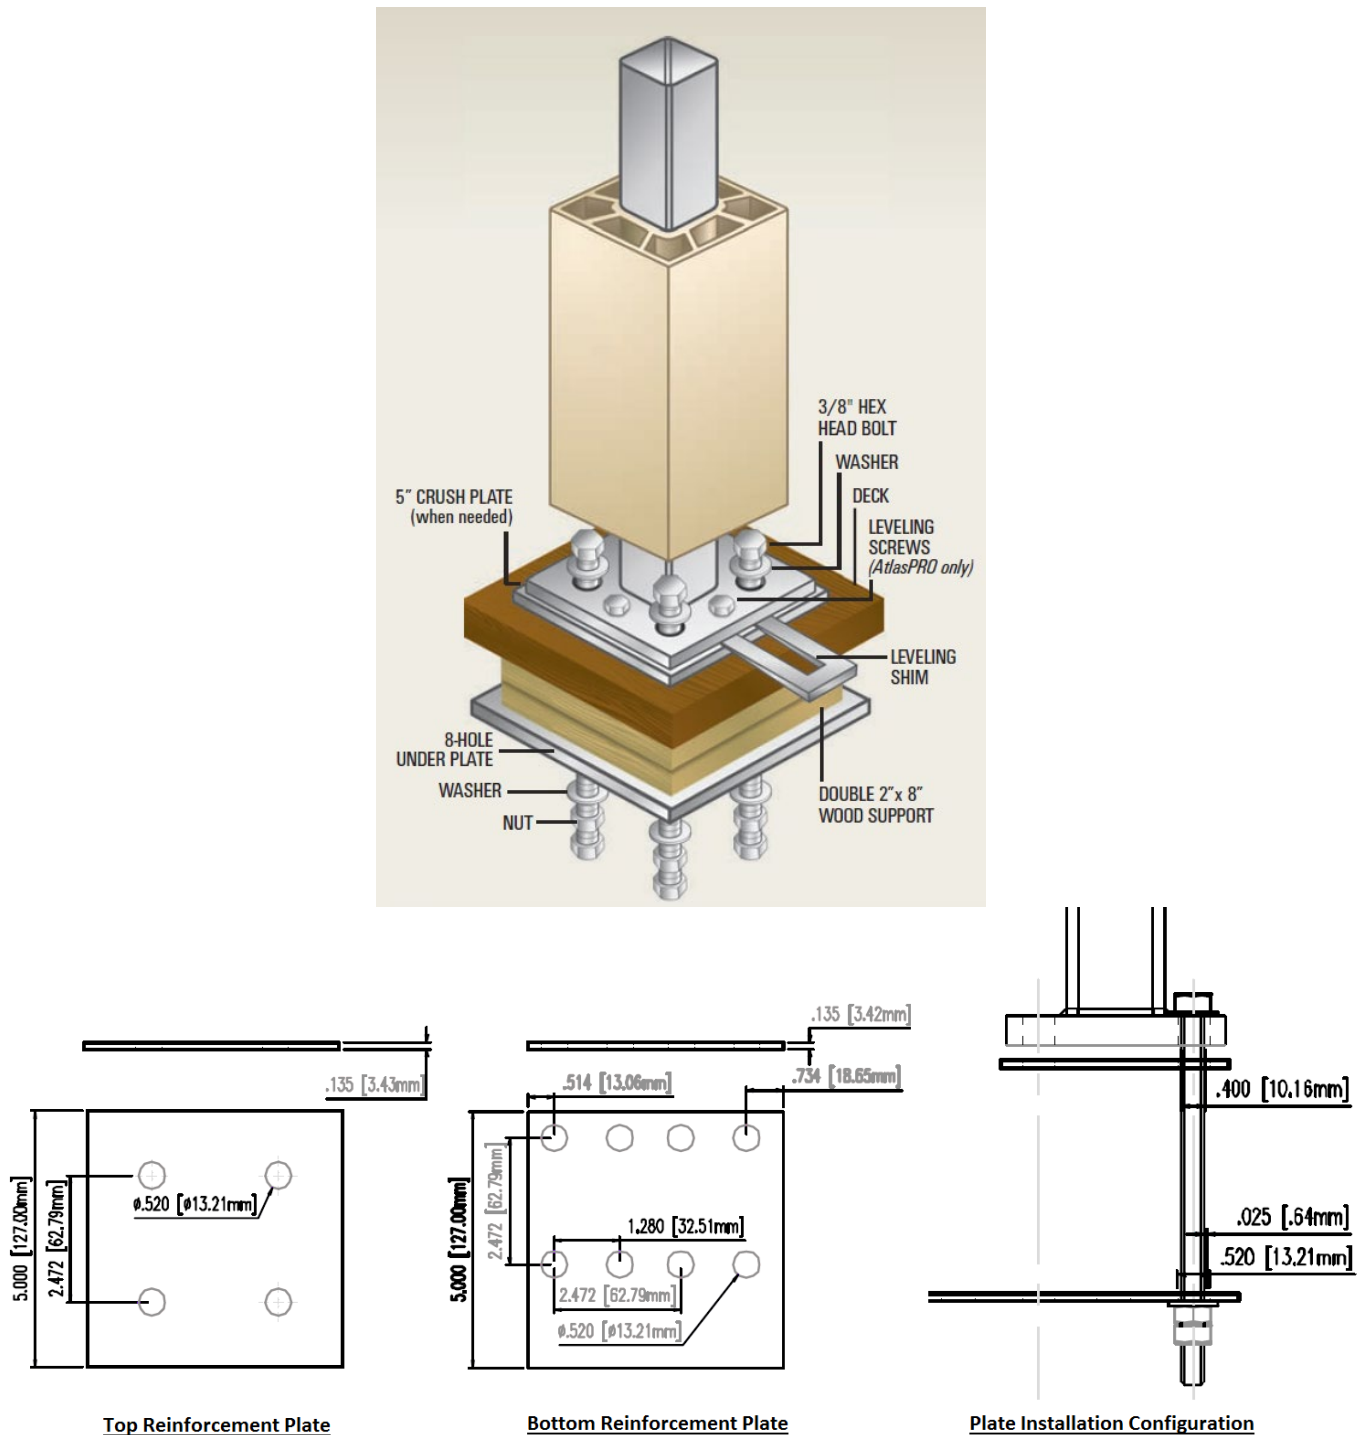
Post Mount Installation to Wood blocking using 5 inch Reinforcement Plates
